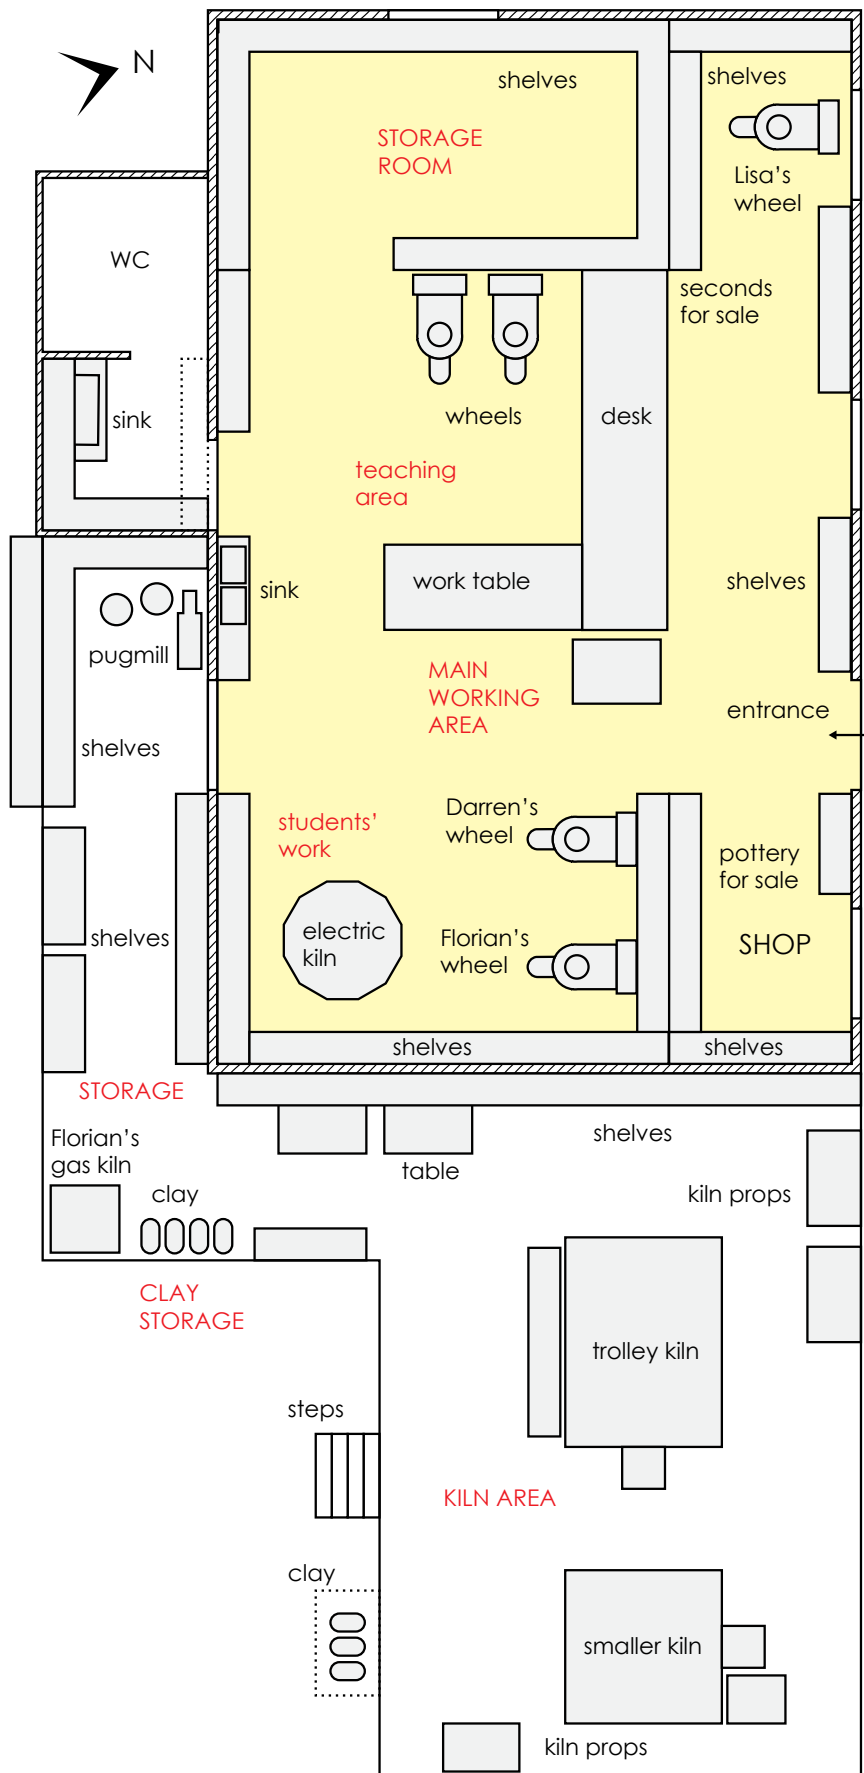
Indicative layout of the Maze Hill pottery building, showing the separation between the main indoors workshop and the outside space, where kilns and storage furniture are located.
